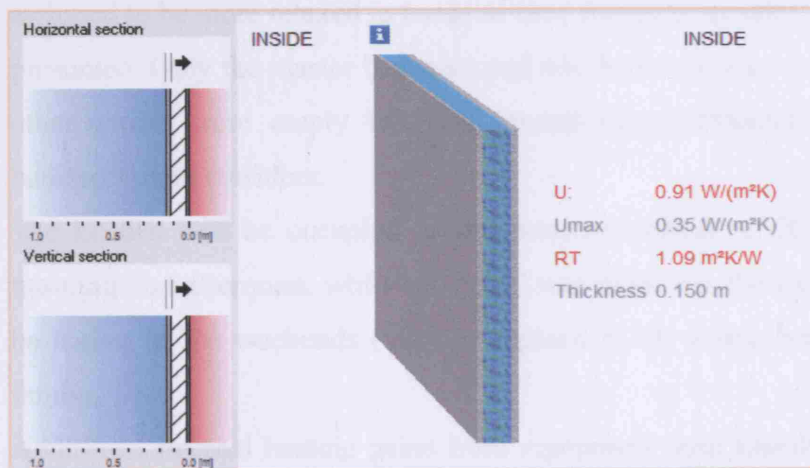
Construction of the internal walls (made with BuildingDeskU 3.2)
